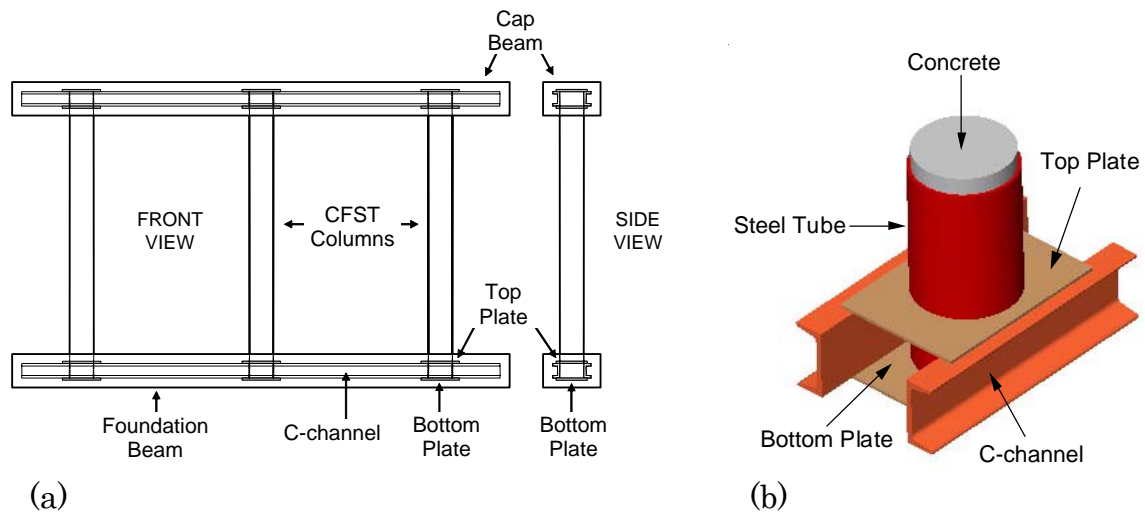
Multi-column pier-bent made up of CFST columns: (a) General description (b) Details of column-to-foundation beam connection
